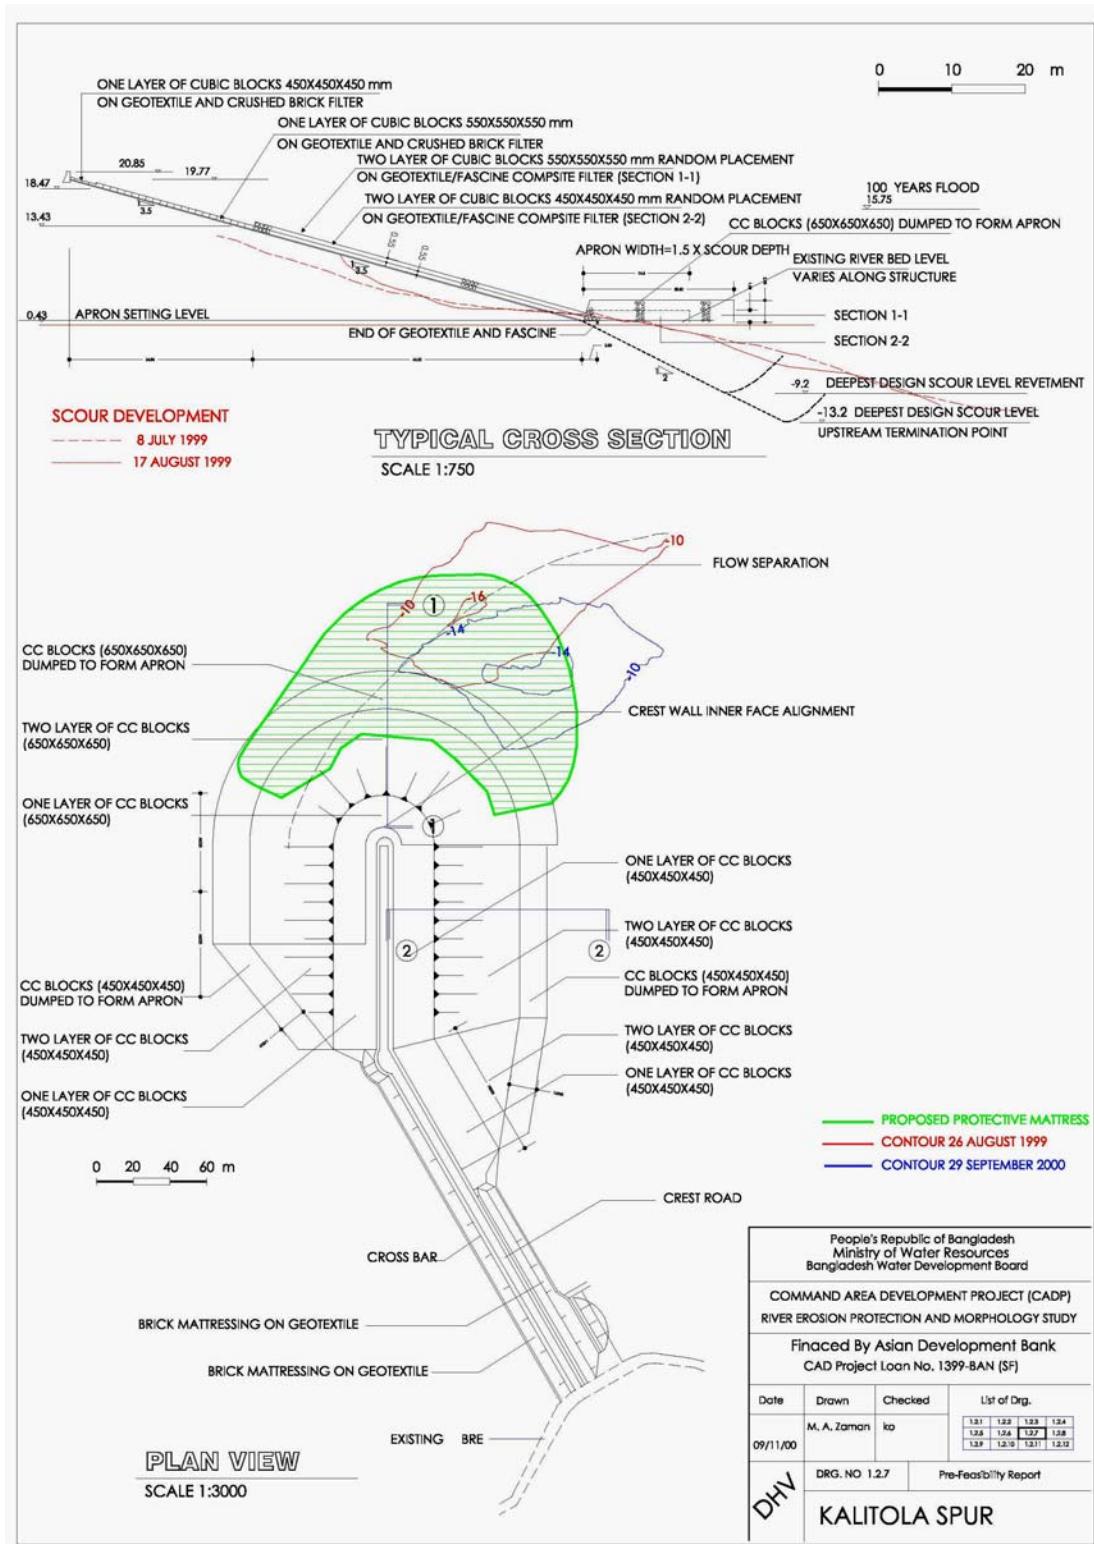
Typical cross-section and layout of the Kalitola Groyne.
